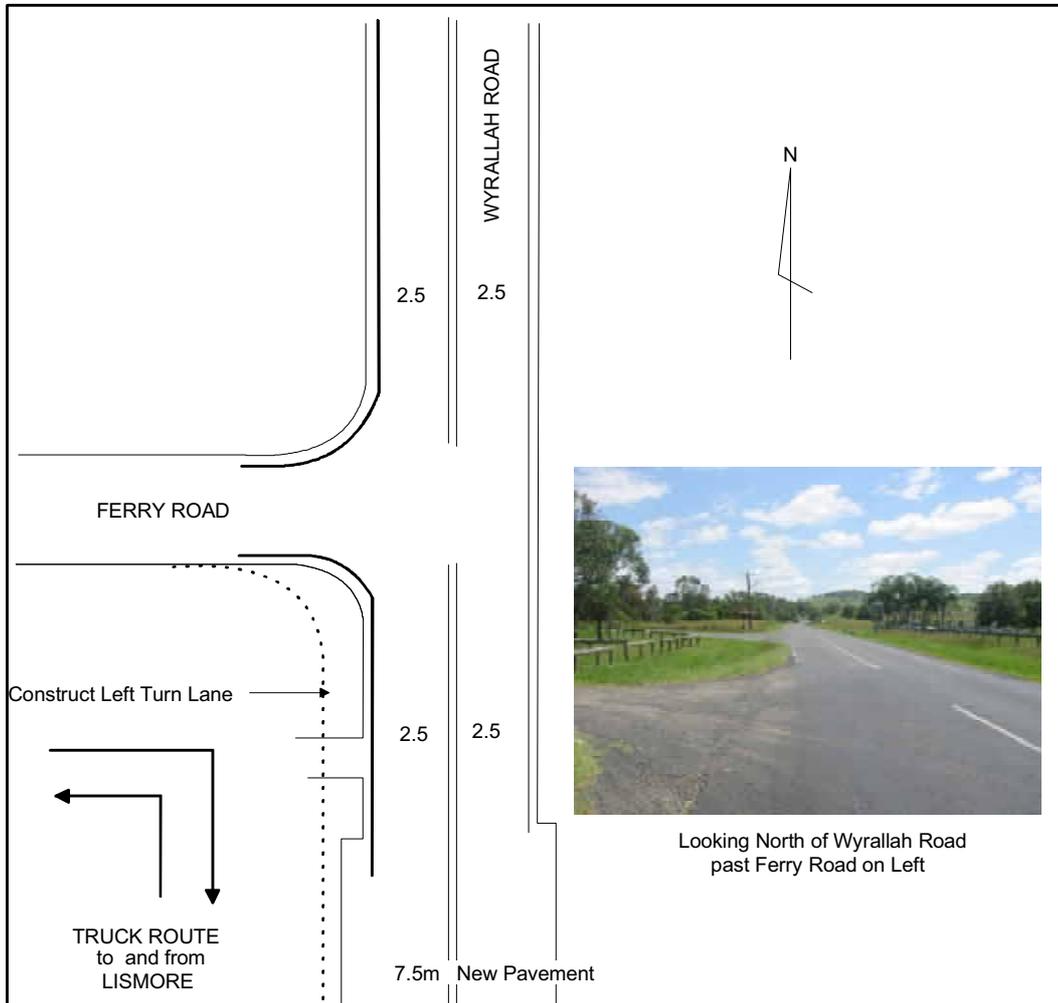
Proposed widening of Wyrallah Road and Wyrallah Ferry Road
